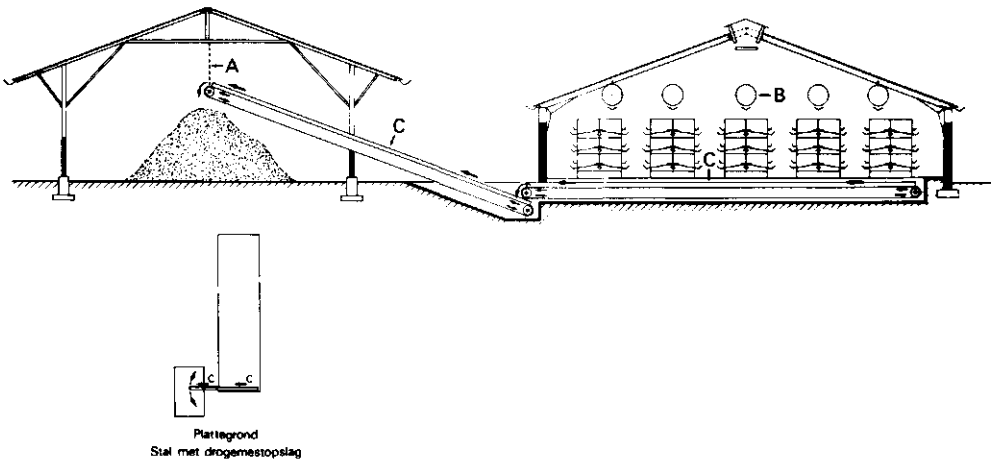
Cross-section of a stall with manure drying and storage outside the stall
